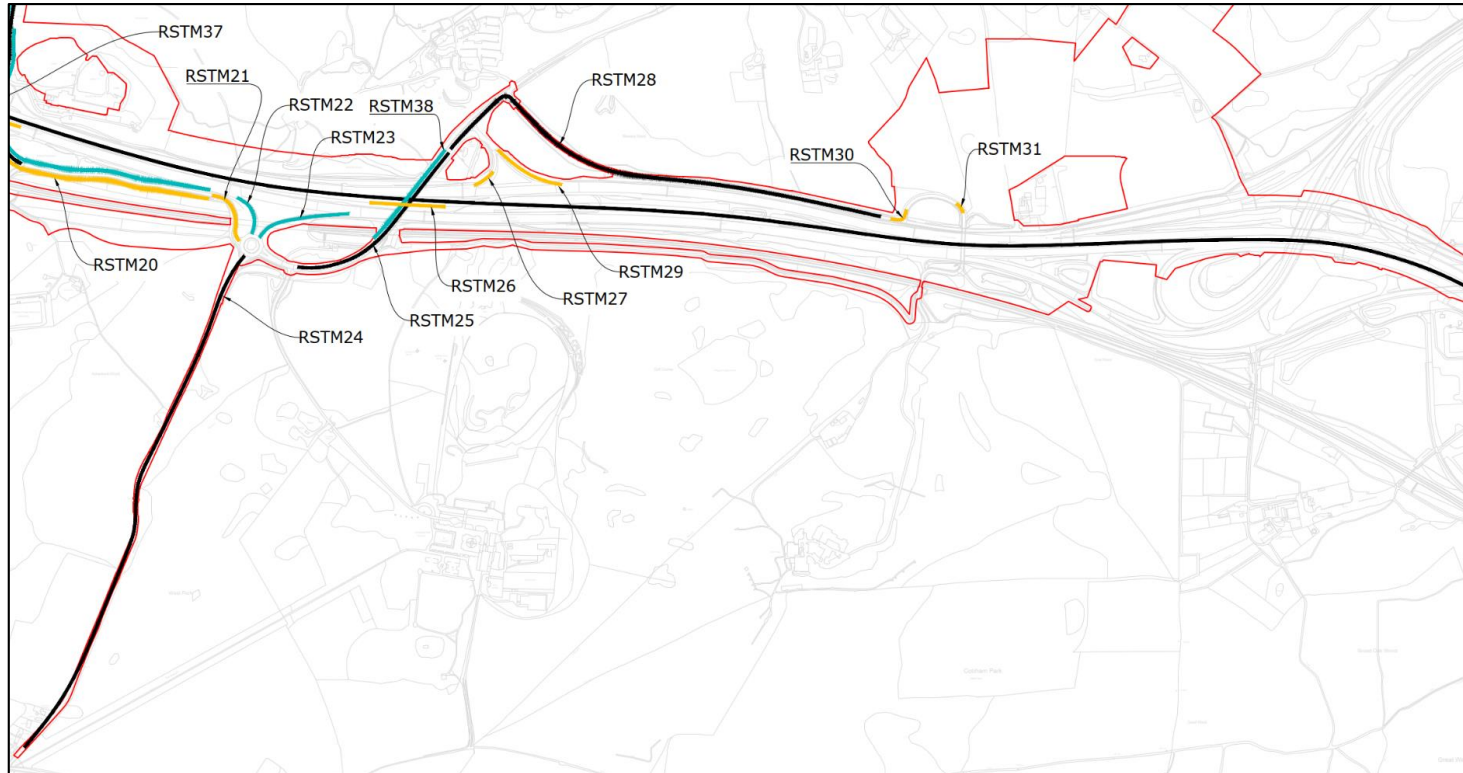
Roads South traffic management measures location plan (2 of 2)
